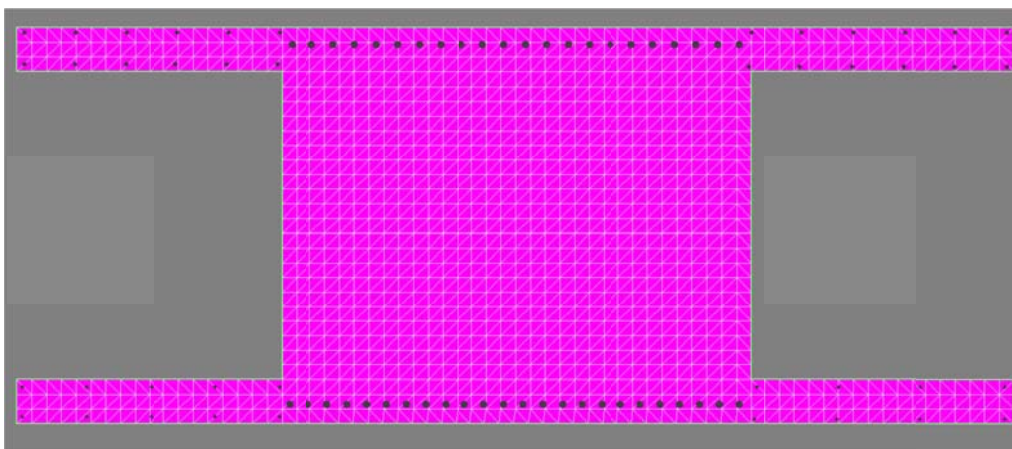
Typical bent cap cross-section of the full-scale Academy Bridge prototype for the case of $12t_s$, considered as the effective slab contribution and slab transverse reinforcement included in cap beam sectional analysis
